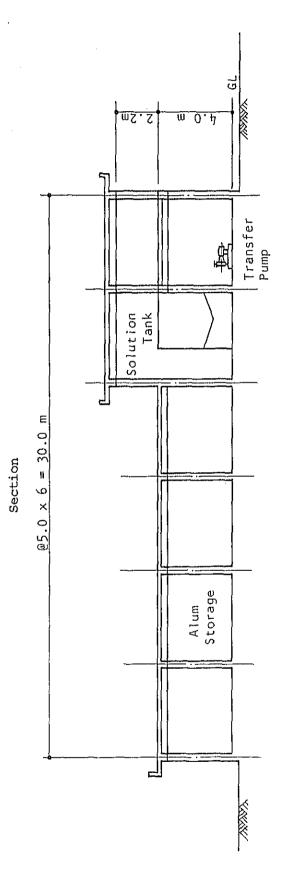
ALUM BUILDING (Northeast Plant)
